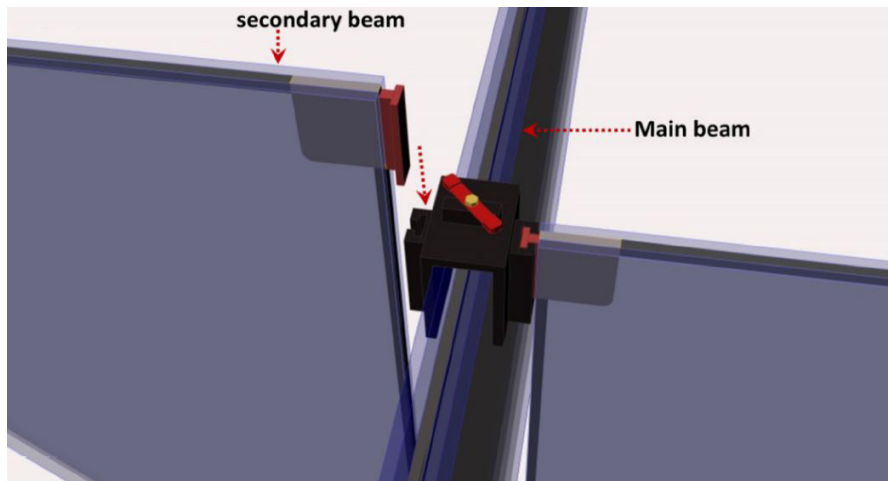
Detail of the connection between main beams and secondary lateral beams.
